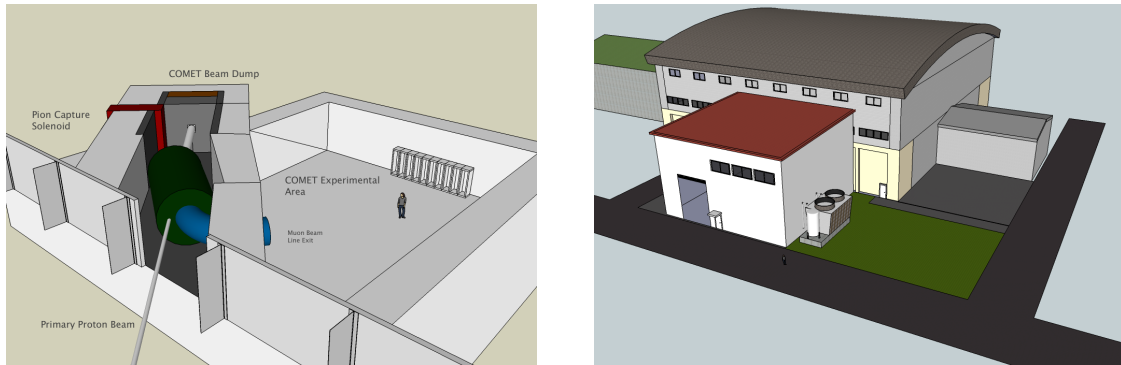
Conceptual view of the COMET beam line floor (left) and experimental hall building (right). The building will be constructed as an annex of the existing hall building.
